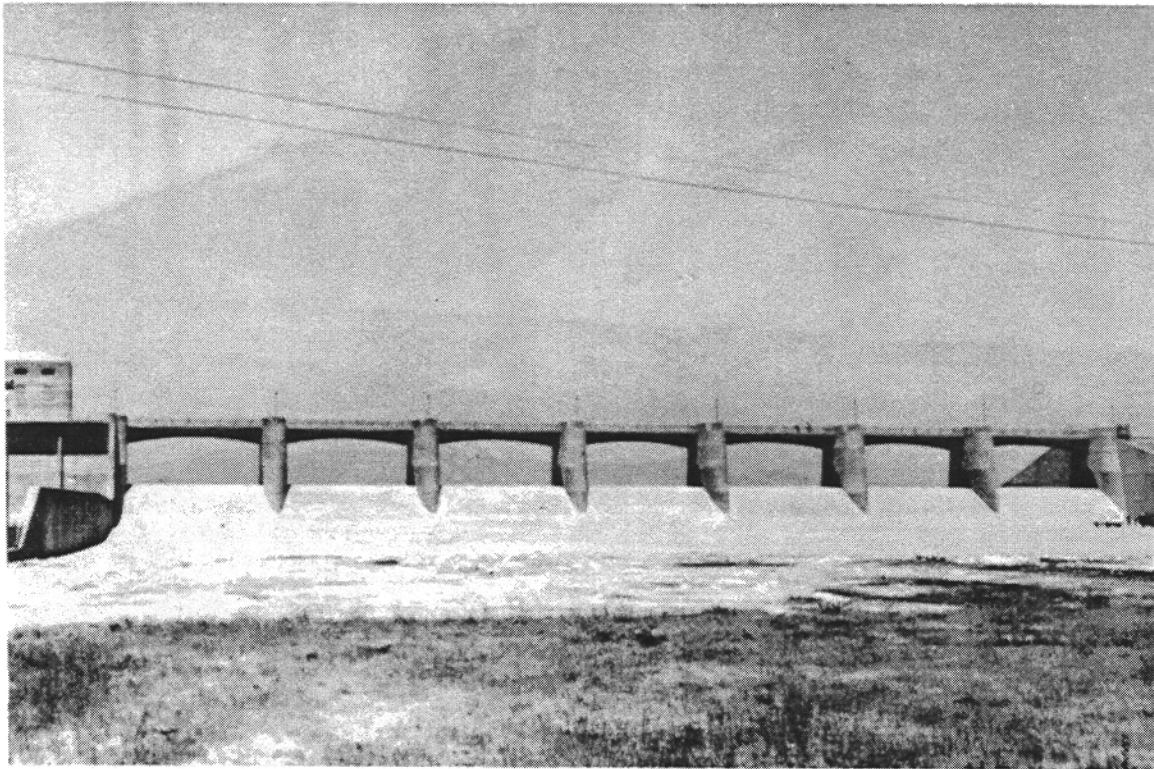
Spillway (Ogee type), with Control House and Outlet Works on left (view from downstream, below spillway apron).
